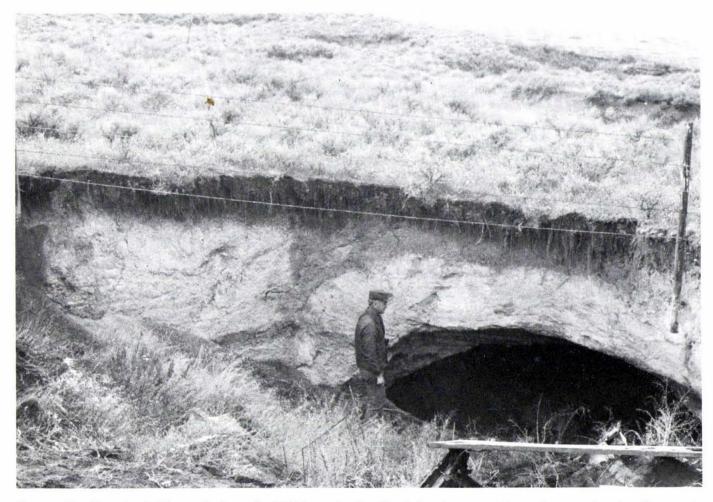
Recent subsidence pit above the Old Monarch mine (fig. 4) showing connecting underground cavity. Fencepost, about 2 m long, was left dangling in mid-air by collapse. The road from which photograph was taken collapsed in 1974 and had to be filled and graded in order to be used again. The cavity is migrating upward by intermittent collapse (stoping) of the mine roof. Original mine workings are estimated to be about 10 m below the surface. Note that the ground above and behind the pit appears to be unaffected by a large cavity only 2 m below, except that plant growth within about 25 cm of the rim is retarded due to the effects of soil dewatering.
